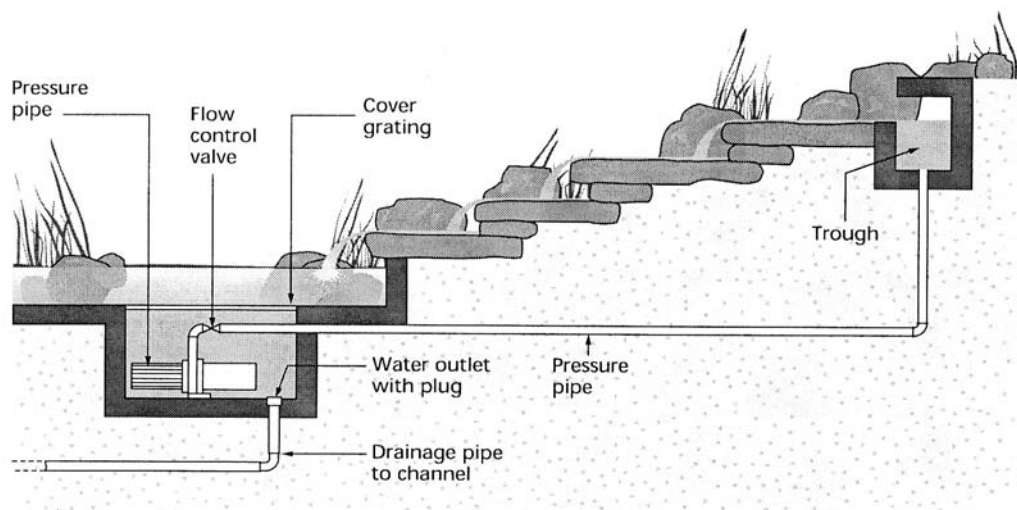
A typical cascade installation (CIBSE, 2004).
